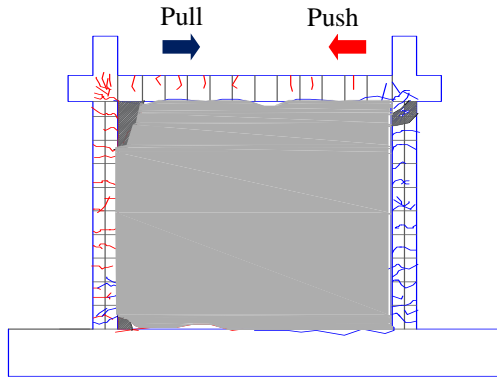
Cracking pattern of Ferro-cement Laminated specimen (IM-FC)
